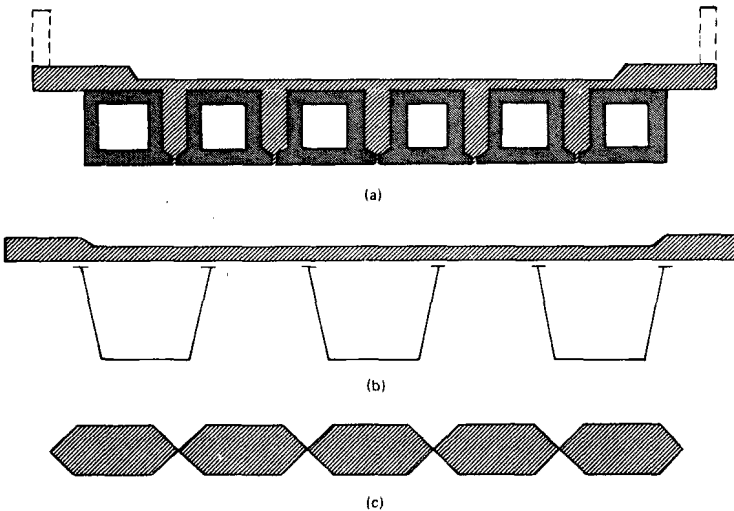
Cross sections of structures in which load distribution takes place mainly through transverse shear: (a) a multibeam bridge; (b) a multi-spine bridge; (c) idealized articulated plate.
